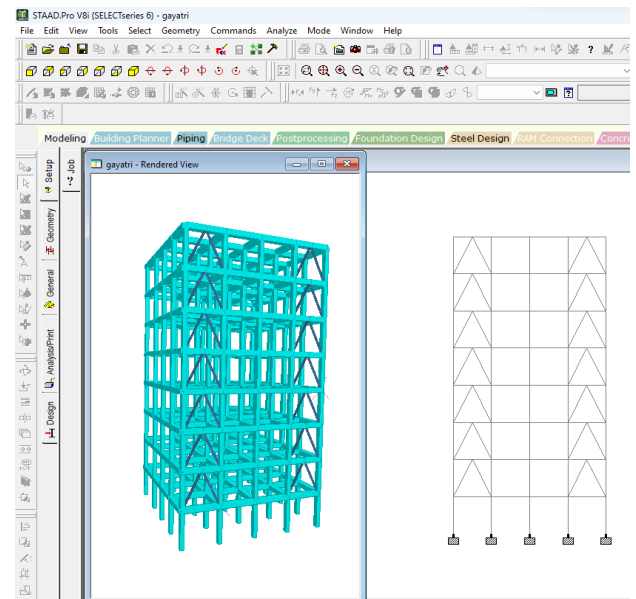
3-D and Elevation View of Inverted V (Chevron) Braced Frame Structure
